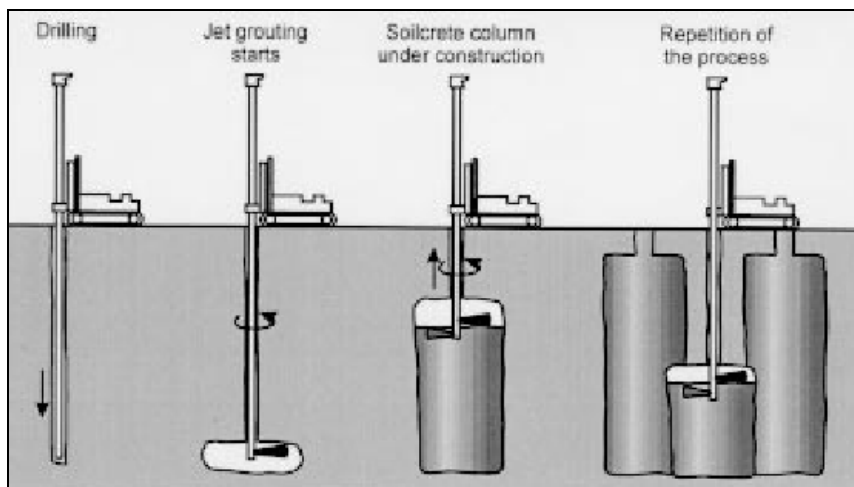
, Schematic drawing of jet grouting process showing construction of columns.
